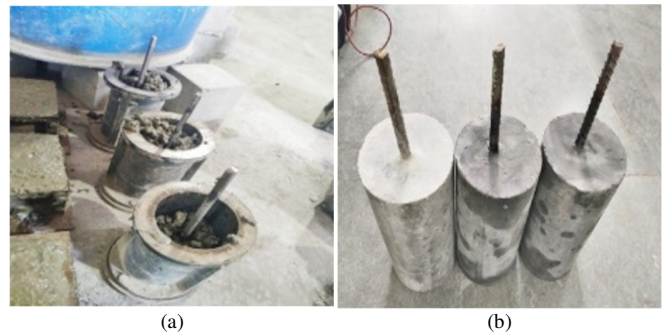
(a) Casting of concrete specimens, (b) specimens after demoulding.
